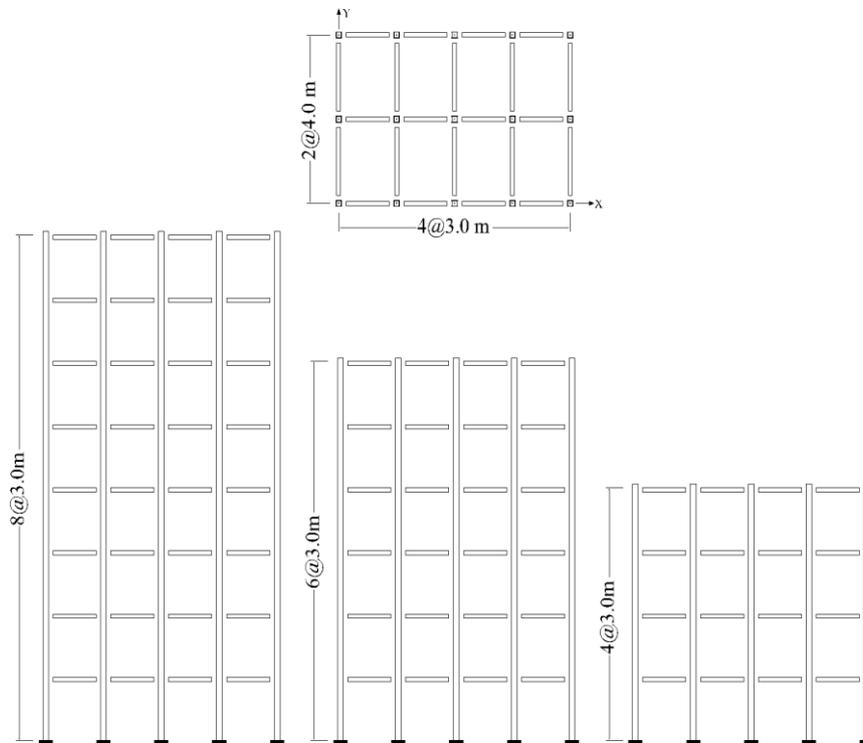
Configuration of plan and elevation of 8, 6 and 4 stories structures
